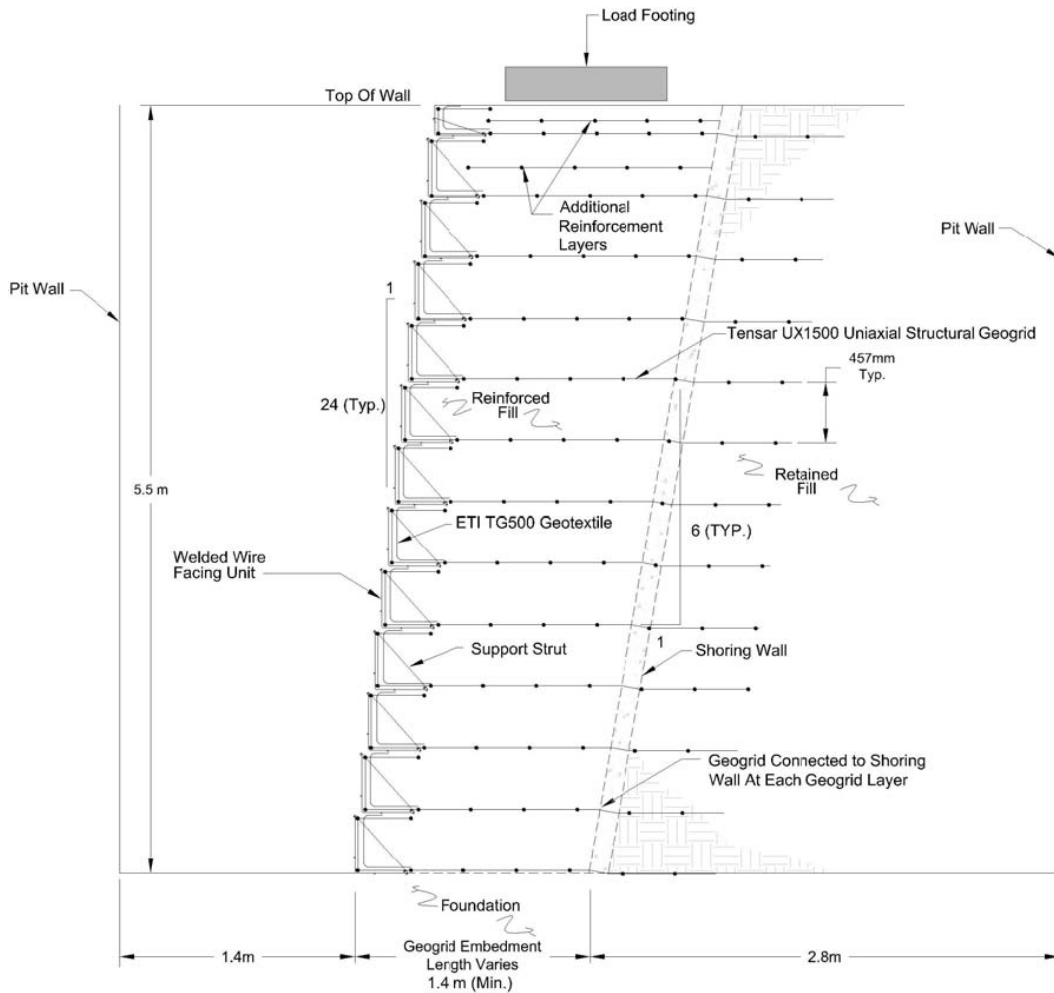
Typical cross-section of full-scale field test with reinforcement connected to the existing shored wall (Morrison et al., 2006)
